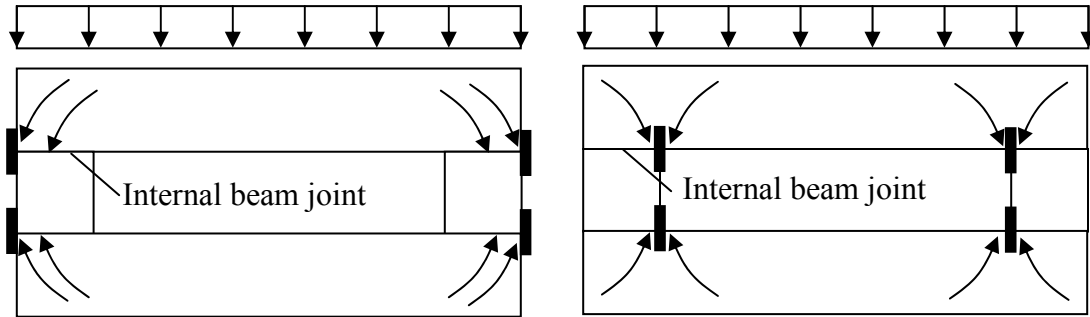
Diaphragm reaction force flow: (a) perimeter shear wall structure; (b) interior shear wall structure.
